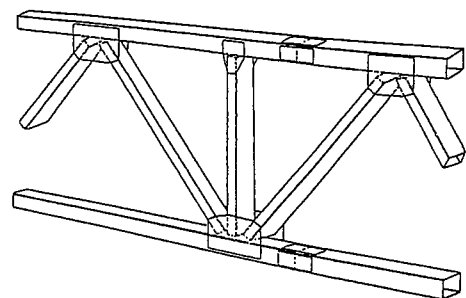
Application image of box columns made from high fracture toughness steel to truss bridge
